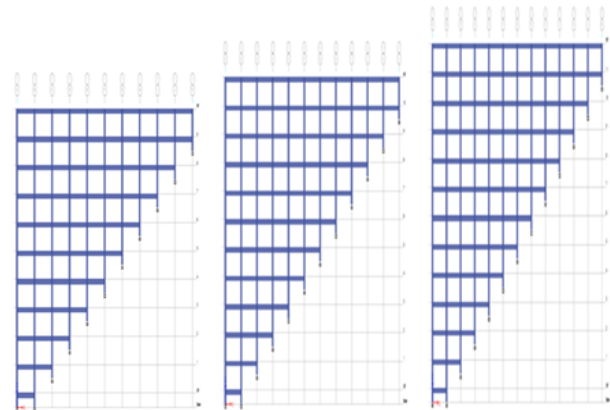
Building is of G+9, G+10, G+11 storeys, constructed in step back building frames
